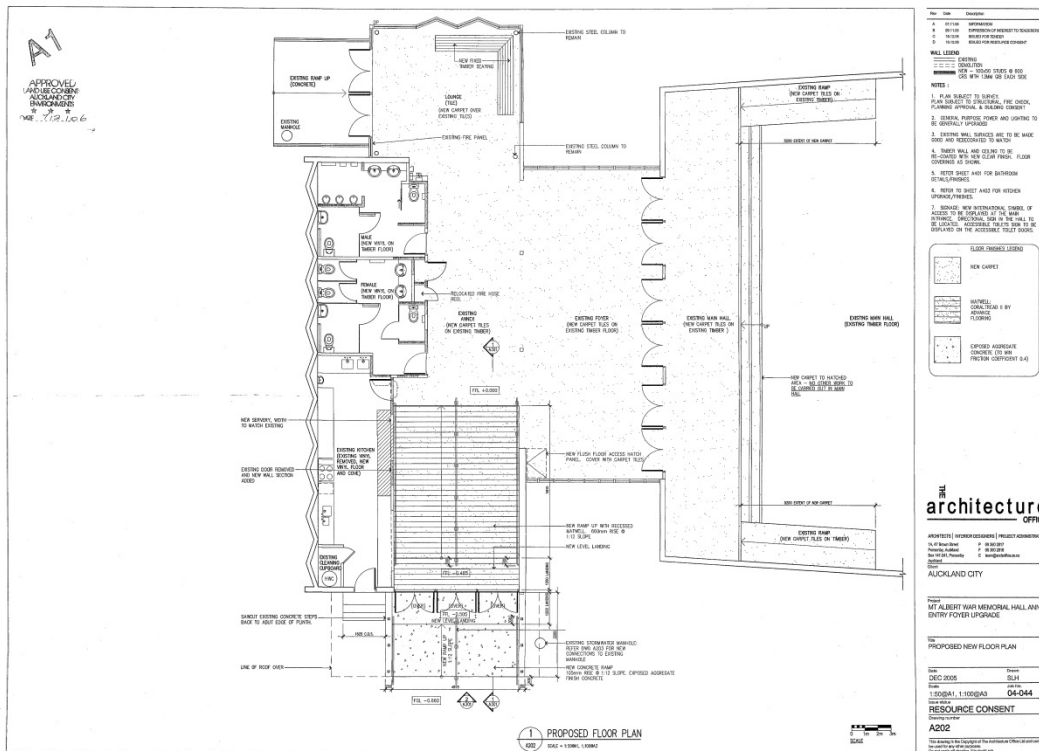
Plan shows the current rear building. Canopy Addition and Internal Alterations at Mt. Albert War Memorial Hall, The Architecture Office, December 2005.
